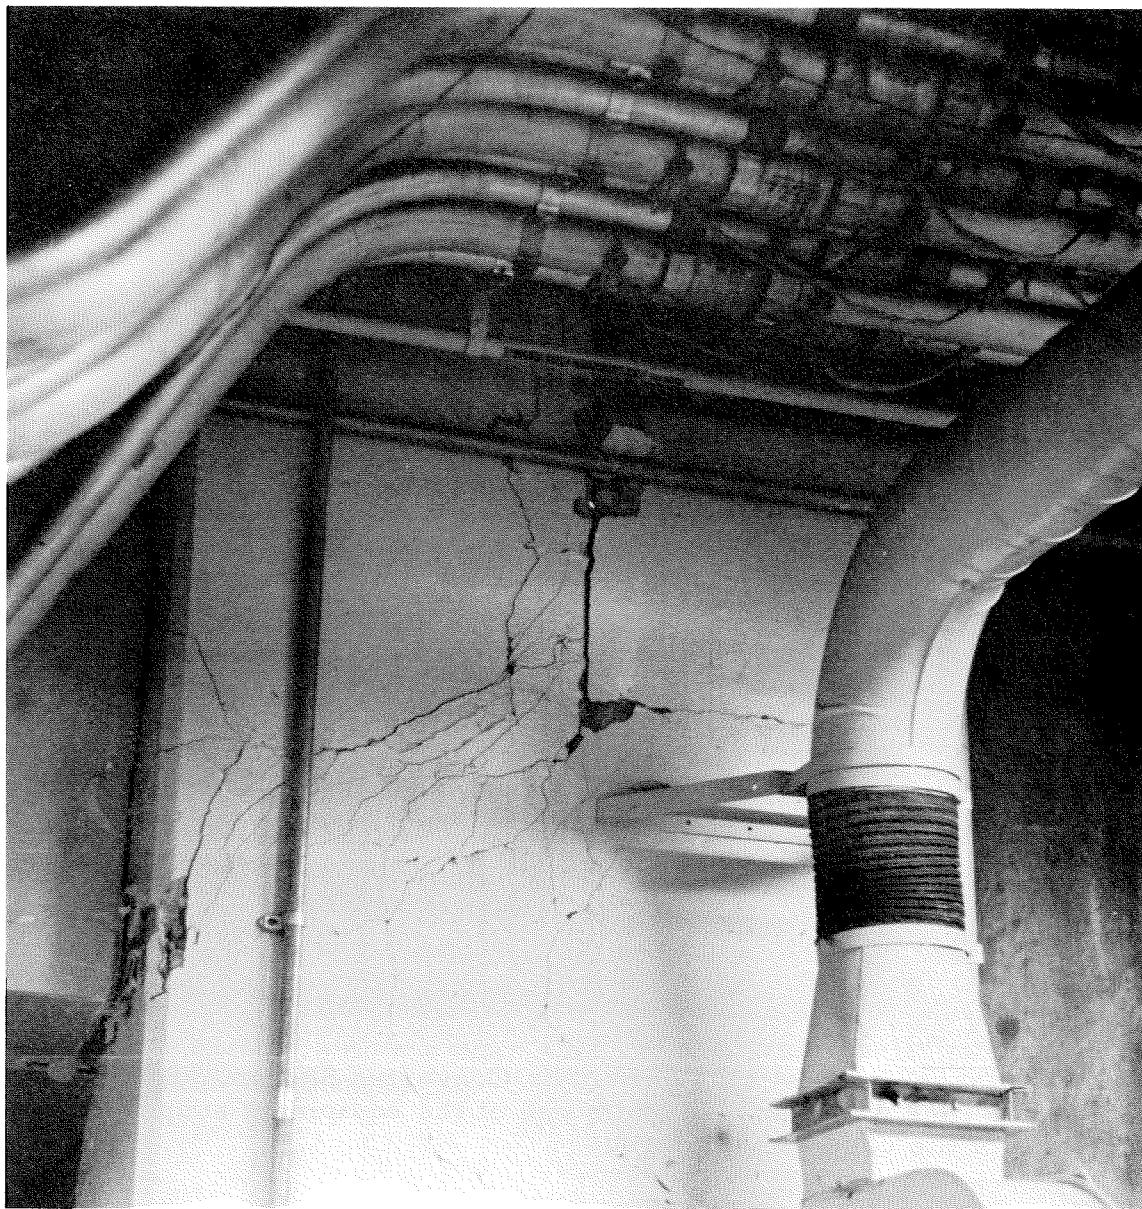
Basement support column at juncture of service section and the valve section, Sylmar Converter Station. The two sections of the building tended to move independently, fracturing the common support column.
